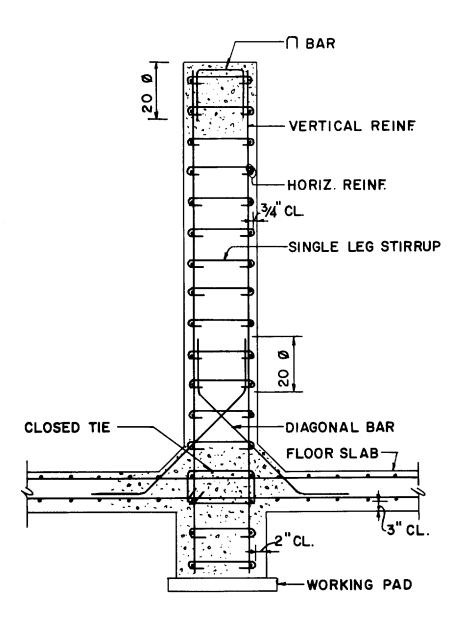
Reinforcement detail of wall with single leg stirrups
